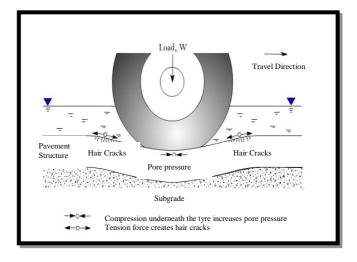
Pavement Failure Under Submerged Condition
